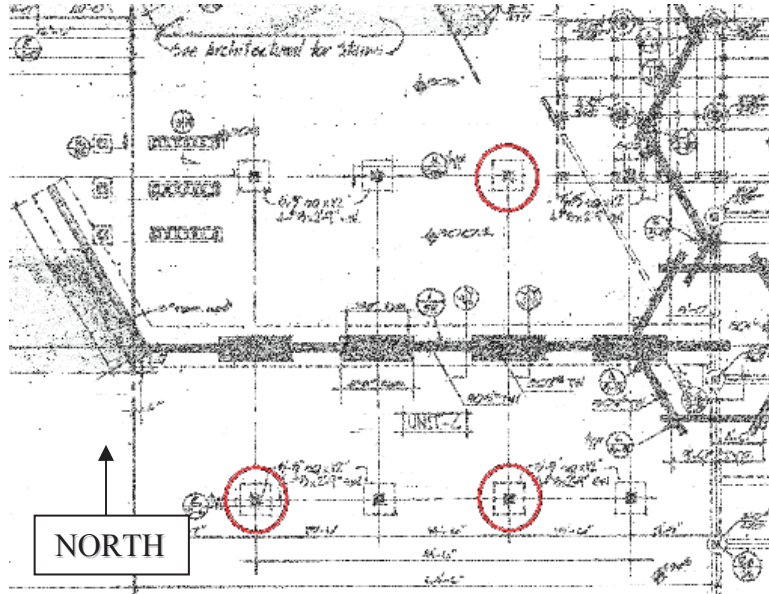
Building C Plan: Posts Requiring Immediate Repair
